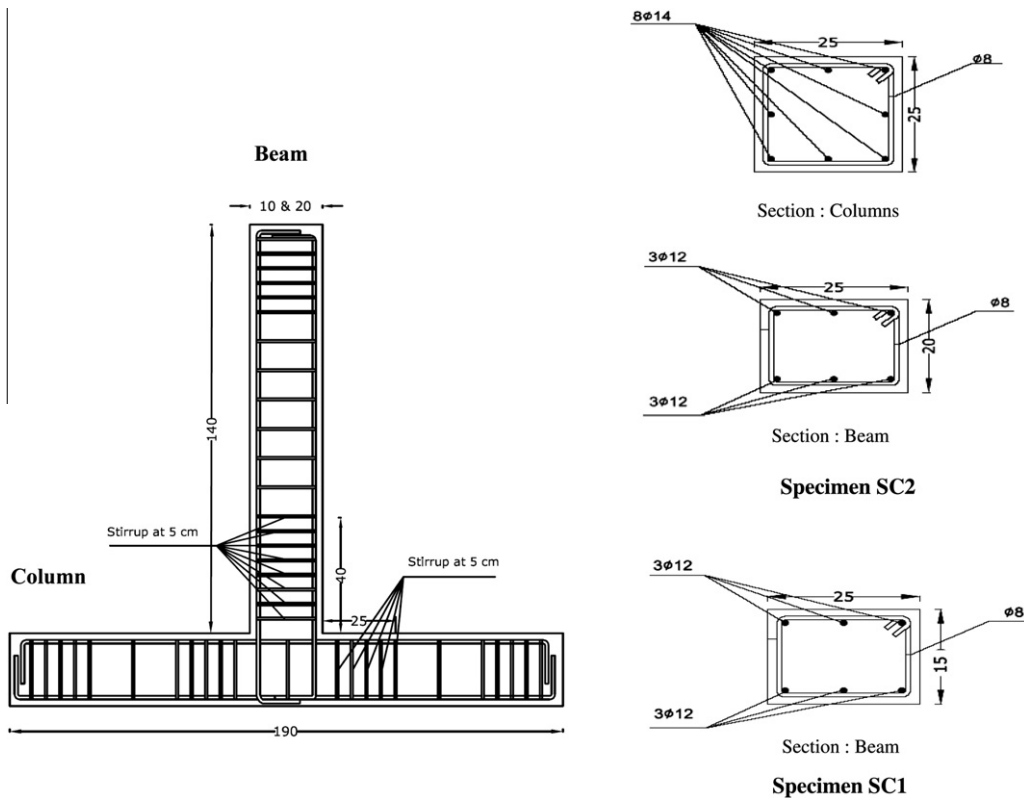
Sections dimensions and arrangement bars of control specimens of SC1 and SC2 (in cm).
